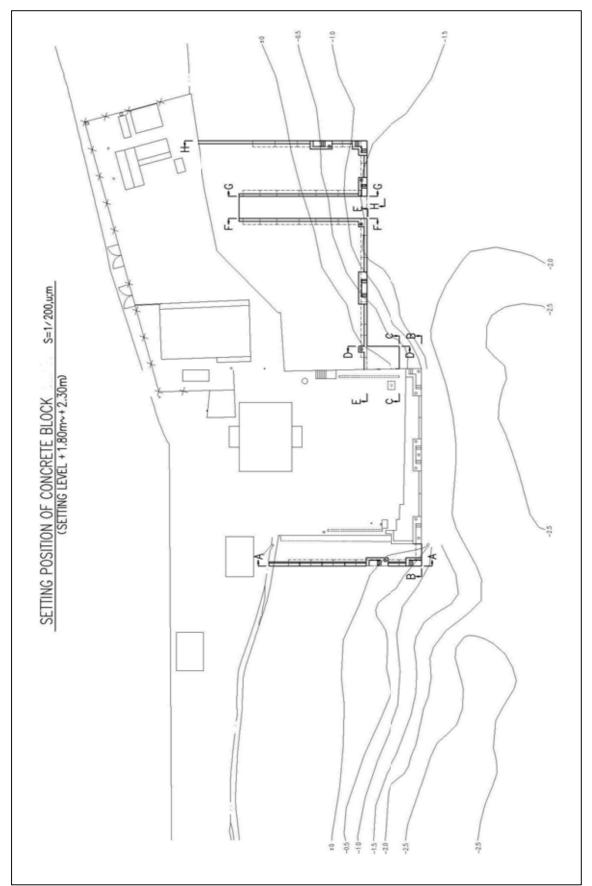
Setting Position of Concrete Block Top Layer (Existing Grand Elevation Level)
